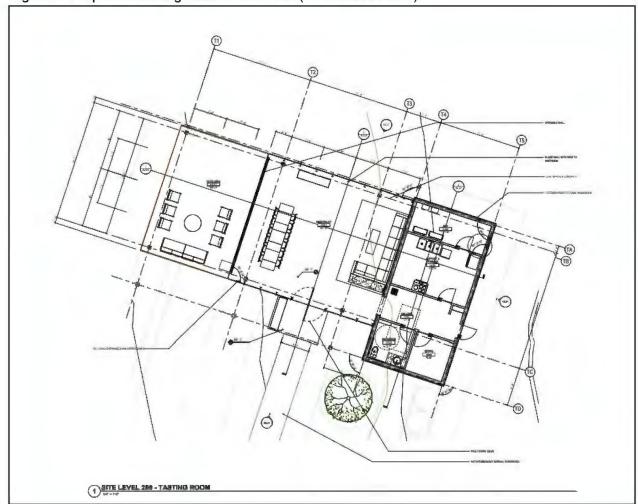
Proposed Tasting Room Floor Plan (see Attachment 1)
